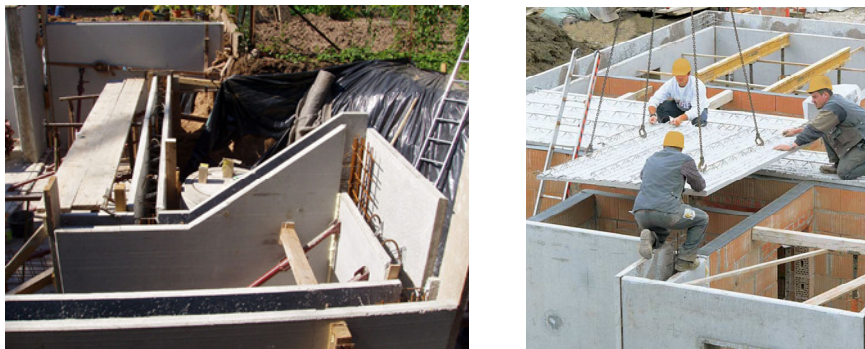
Rationalization through the use of prefabricated components (e.g. hollow reinforced concrete walls and semi precast elements)
